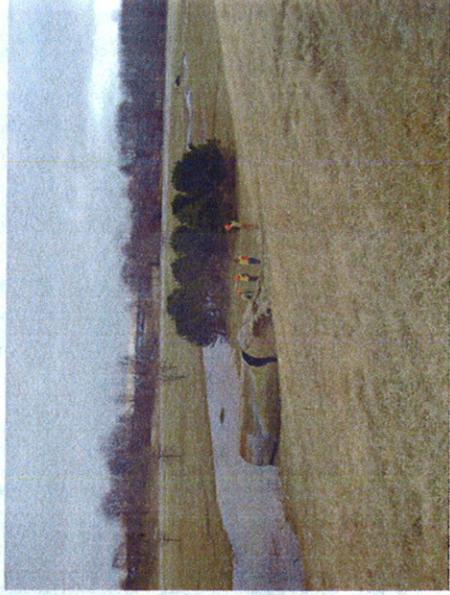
Facing northeast after pipe was cut and dropped to reestablish flow.
